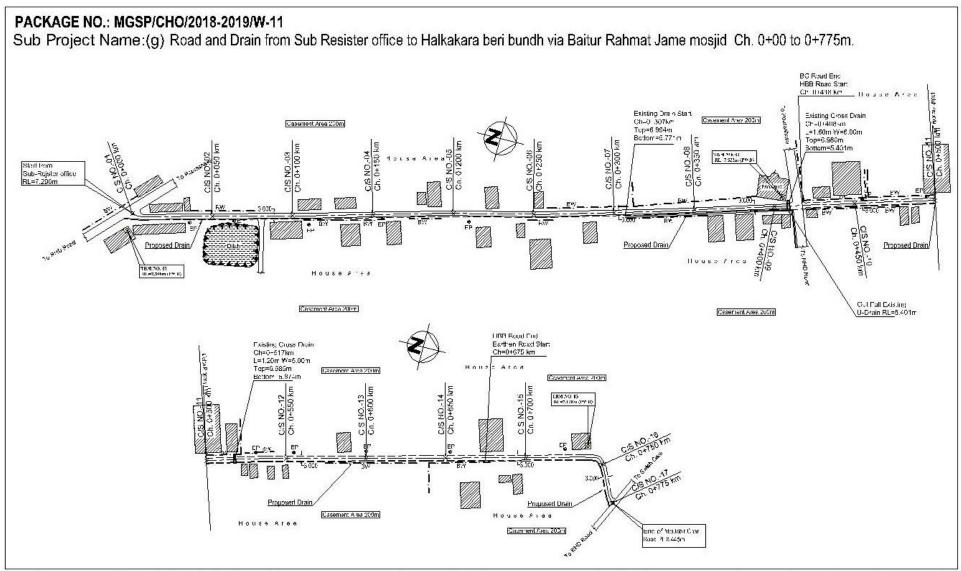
(g-i): Layout Plan of the proposed Subproject area from Sub Register office to Halkakara beri bundh via Baitur Rahmat Jame mosjid [Road part]
